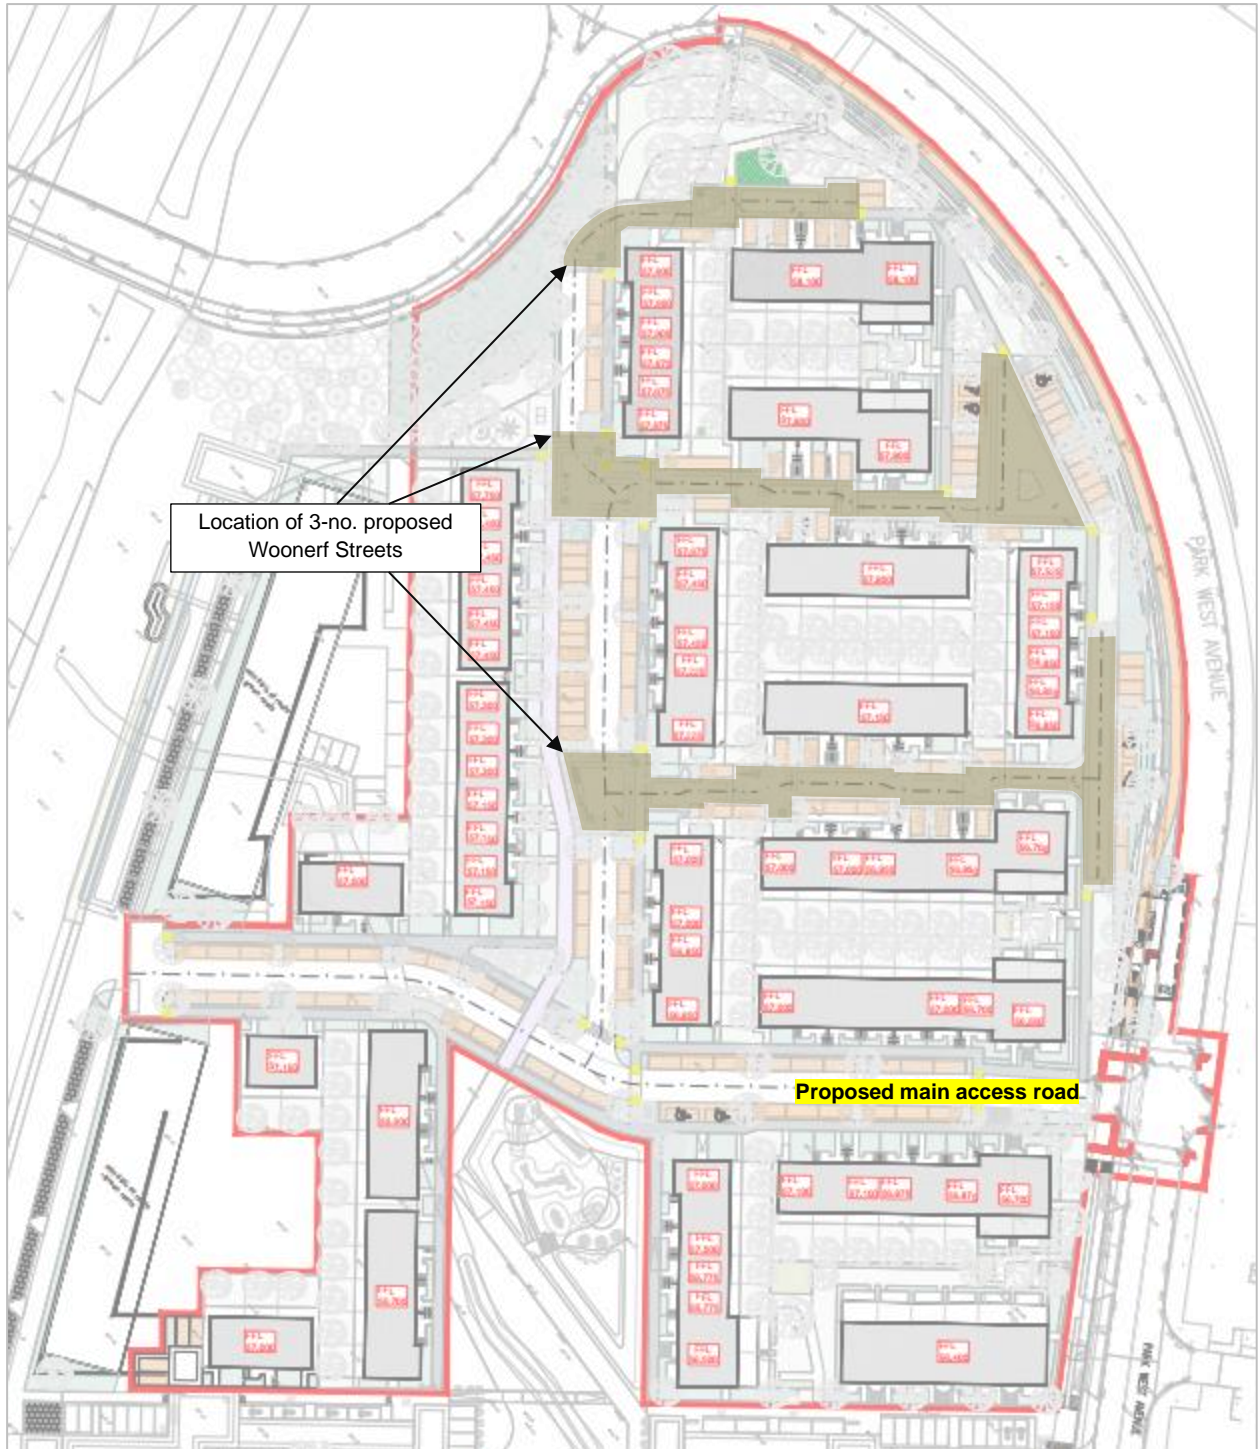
Layout Map showing Location of Woonerf (Homezone) Streets
